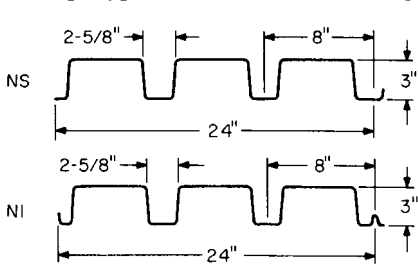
Cross sections of types NS and NI roof deck for 9- to 15-ft spans.
